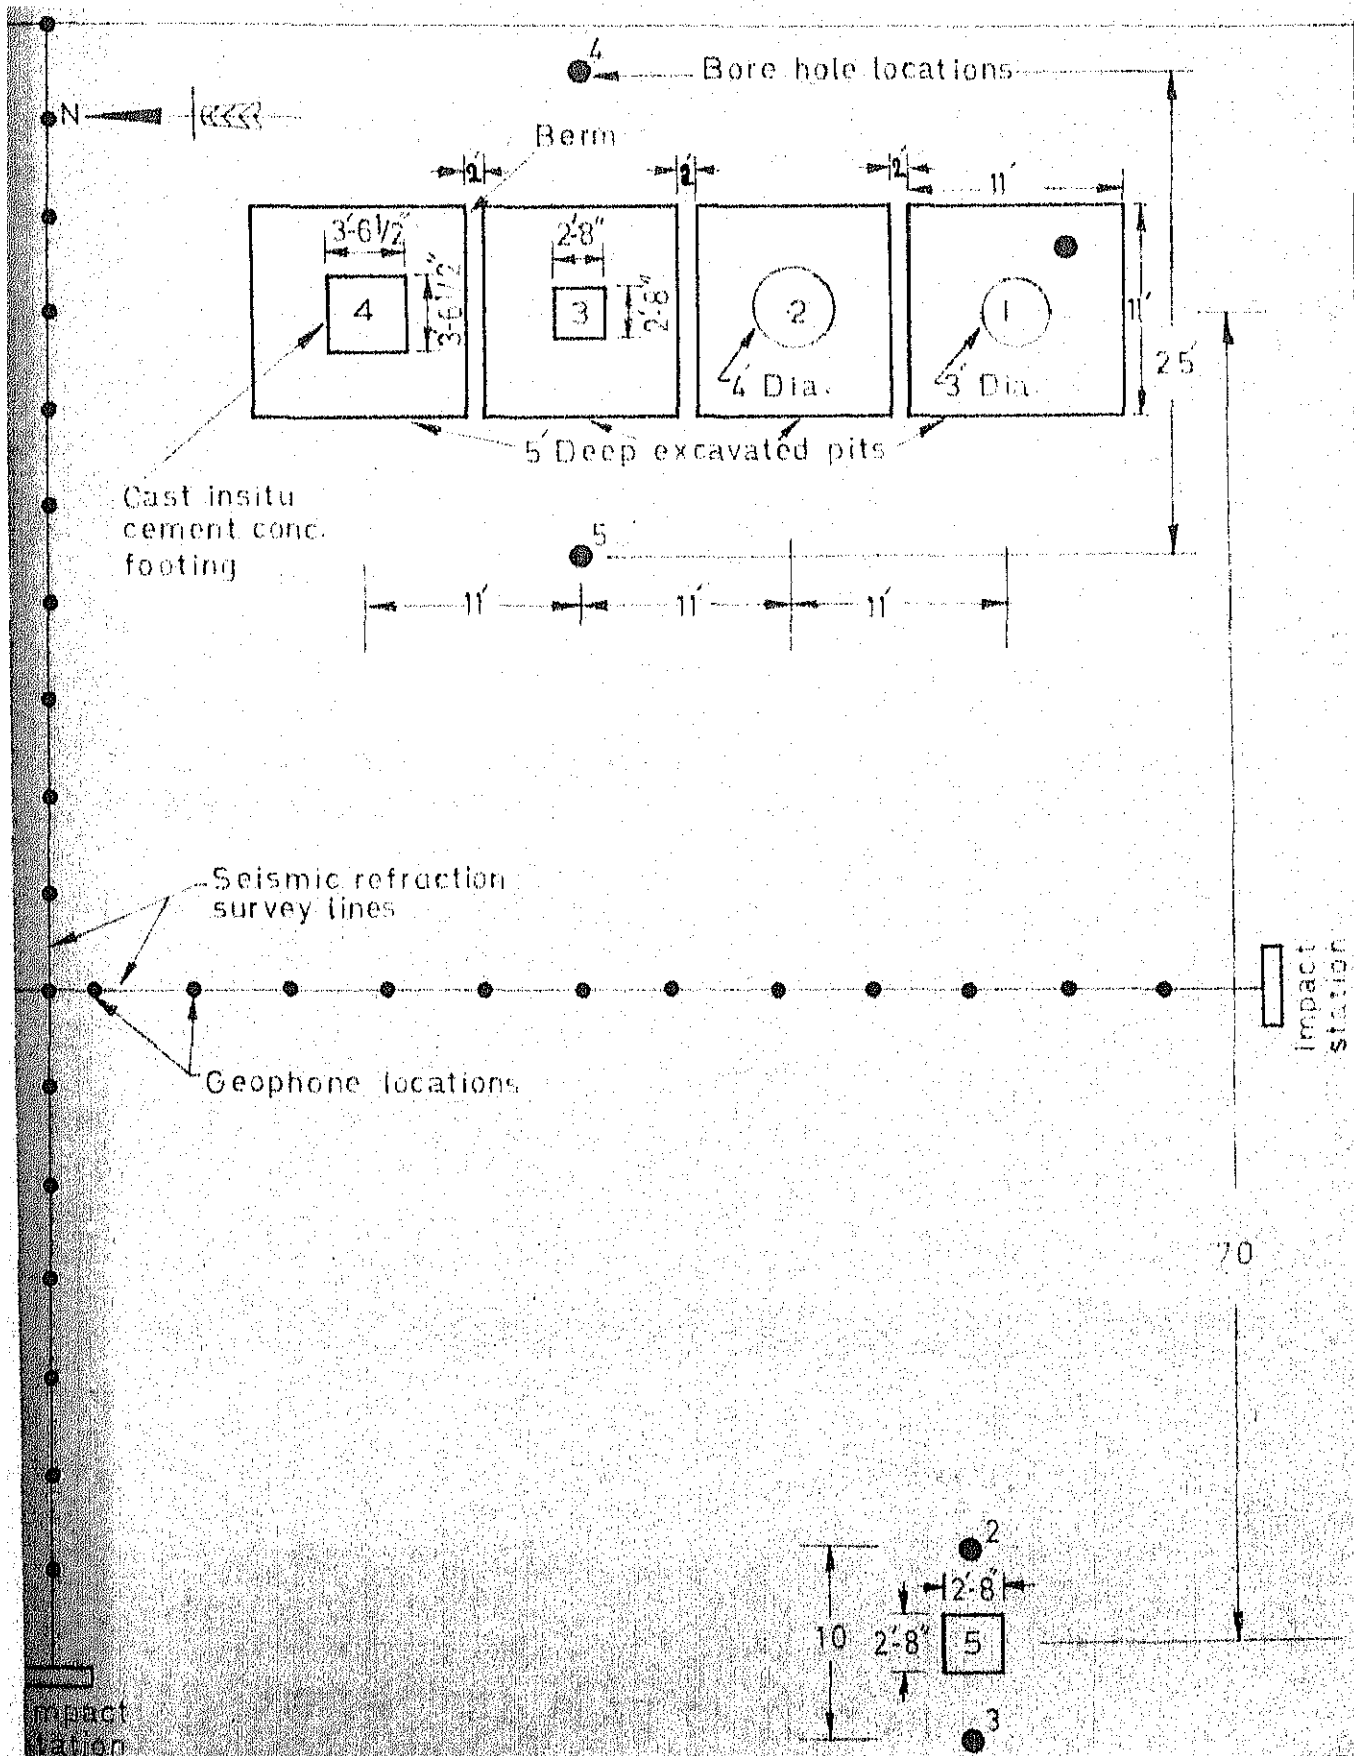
SITE PLAN OF TEST AREA AT I.I.T. KANPUR.
